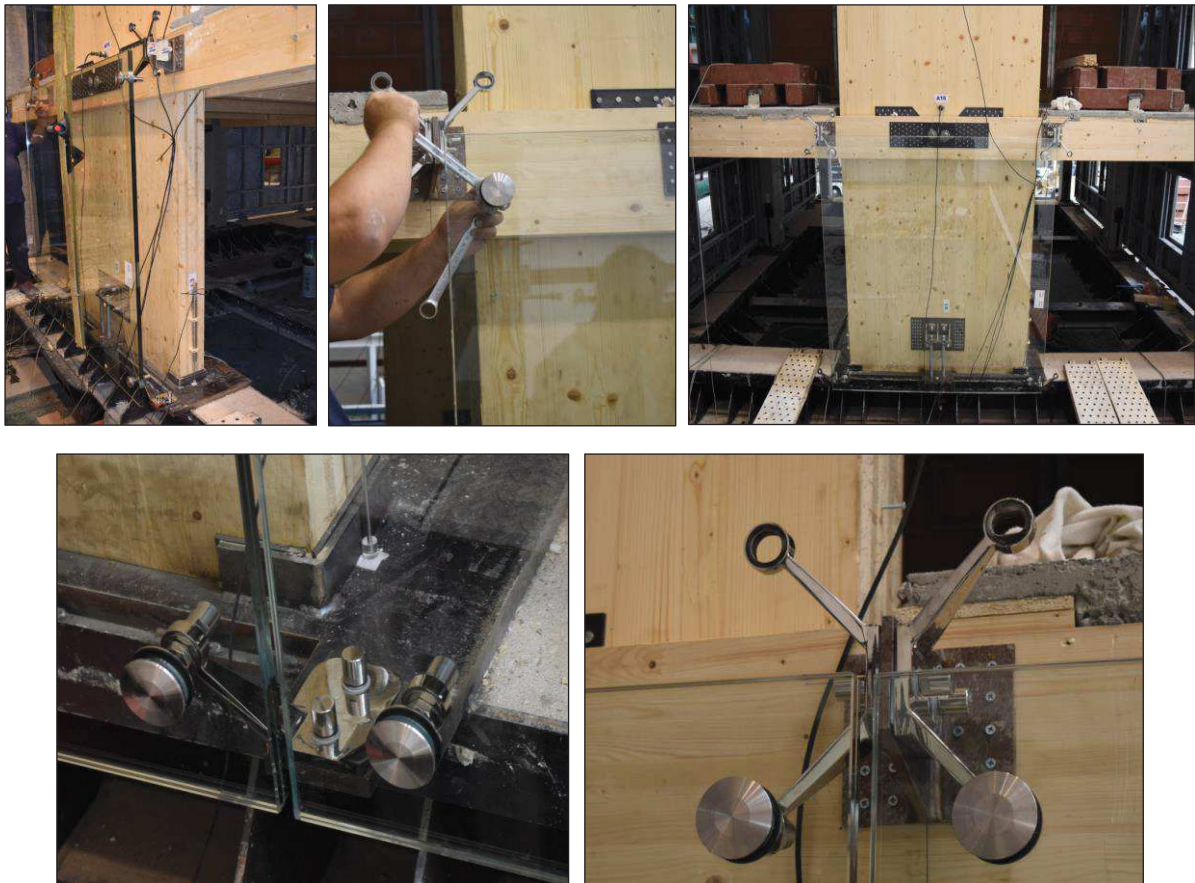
Assembly of the central panel of the East-side facade: lifting in place of the panel (top - left), fixing the rotules to the spider connector (top - centre), final configuration of the central panel (top - right), spider connector welded on the foundation base (bottom - left), plate/connector assembly screwed to the timber beam (bottom - right).
